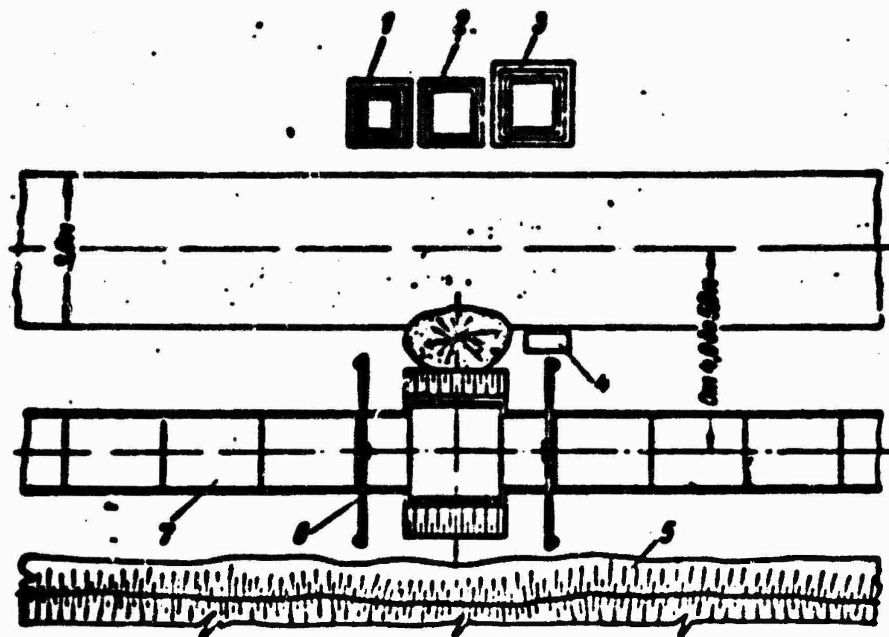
Scheme of preparatory operations in constructing an assembled access gully. 1) Upper section; 2) middle section; 3) lower section; 4) box for the mix; 5) soil pile; 6) sight rail; 7) trench. a) from 4.0 to 5.0 meters.
